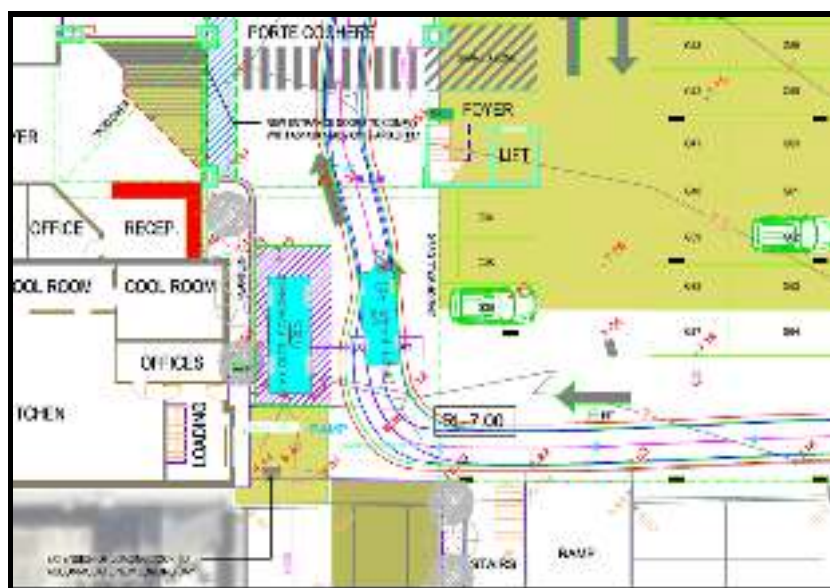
Proposed new loading dock on the ground floor (Source: Innovate, Rev C, July 2024)
